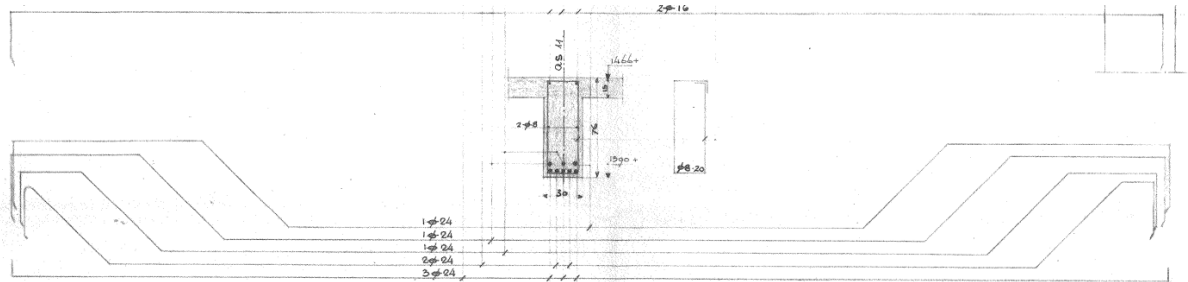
Stationsplein 107 - Leiden beam drawing
